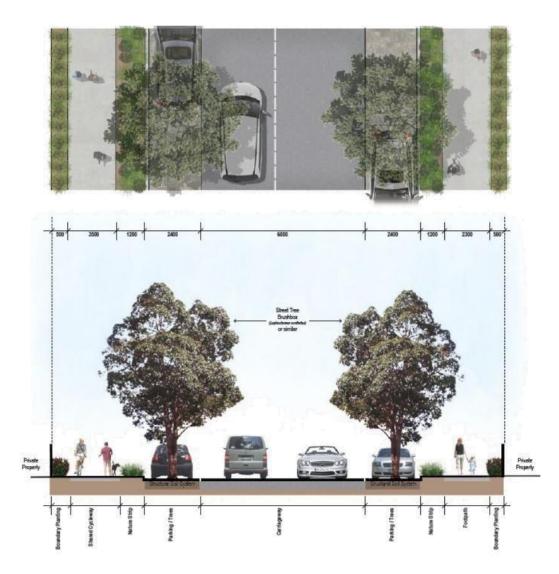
3: <u>Layout of the street (tree lined boulevard) connecting the Neighbourhood Centre with the local</u> park and Bonds Creek corridor. This figure has been added to reflect the desired layout and cross-section of the street that connects the Neighbourhood Centre with the local park and Bonds Creek corridor, as detailed in Council report dated 25 August 2021.
